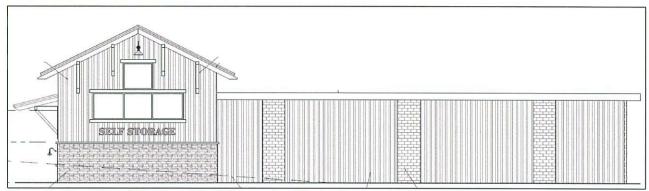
Elevation of Proposed Self Storage Facility, looking west.
